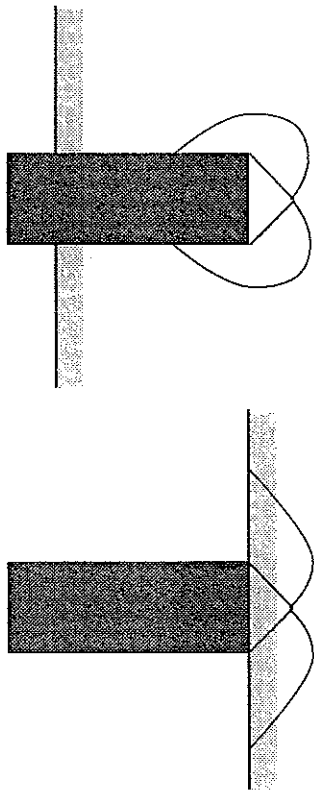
(a). Approximate failure mechanisms for surface and submerged footings.
